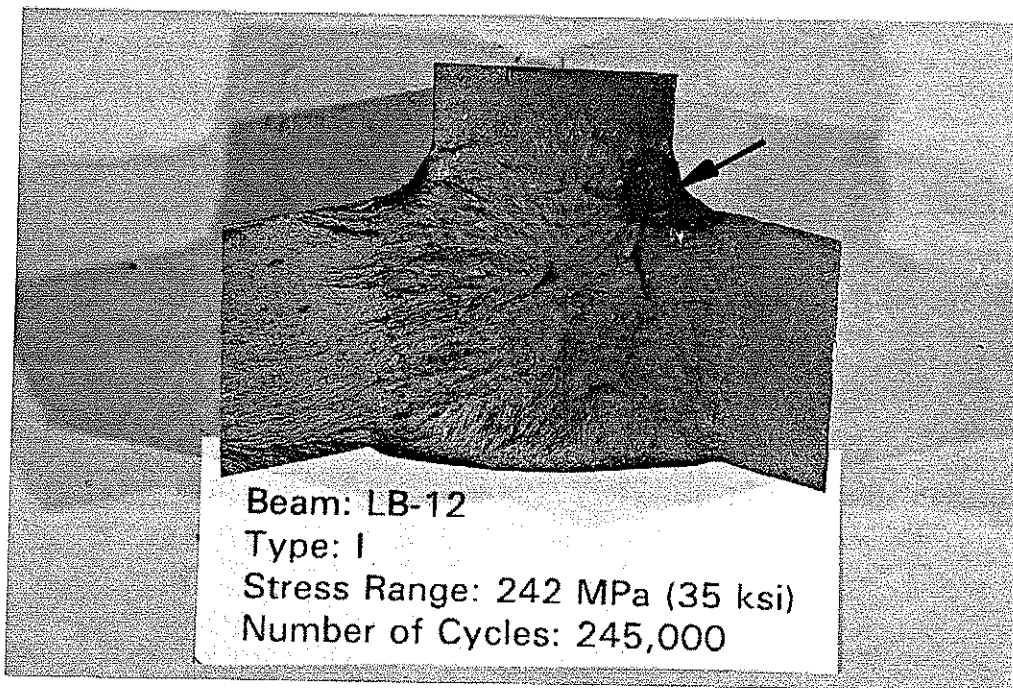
Fatigue Crack Initiation at a Weld Surface Defect (12/93/24-4)
